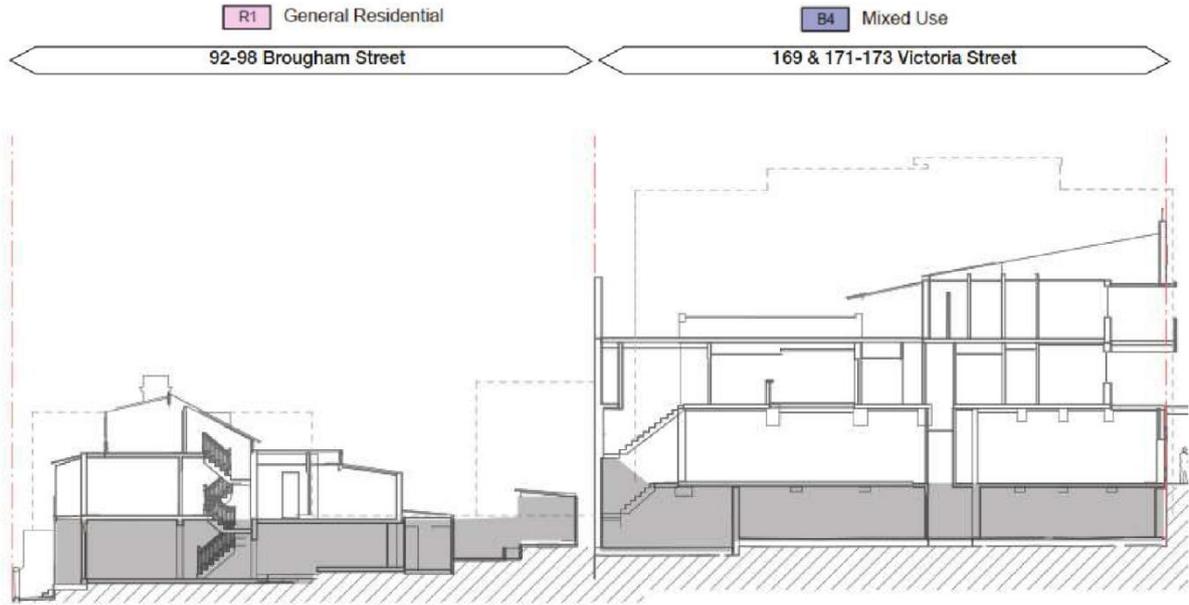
Existing cross section looking north - Brougham Street left, Victoria Street right
